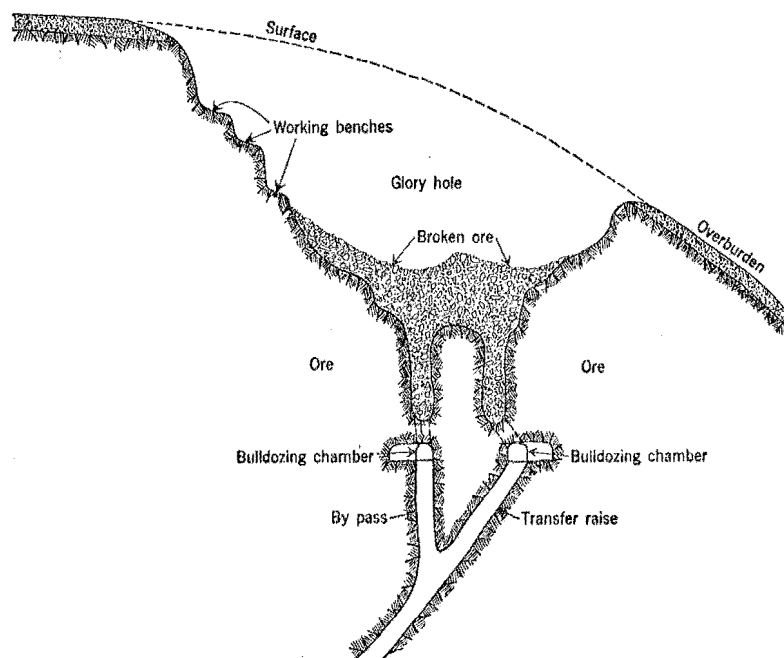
Vertical section of glory hole, Britannia mine.
